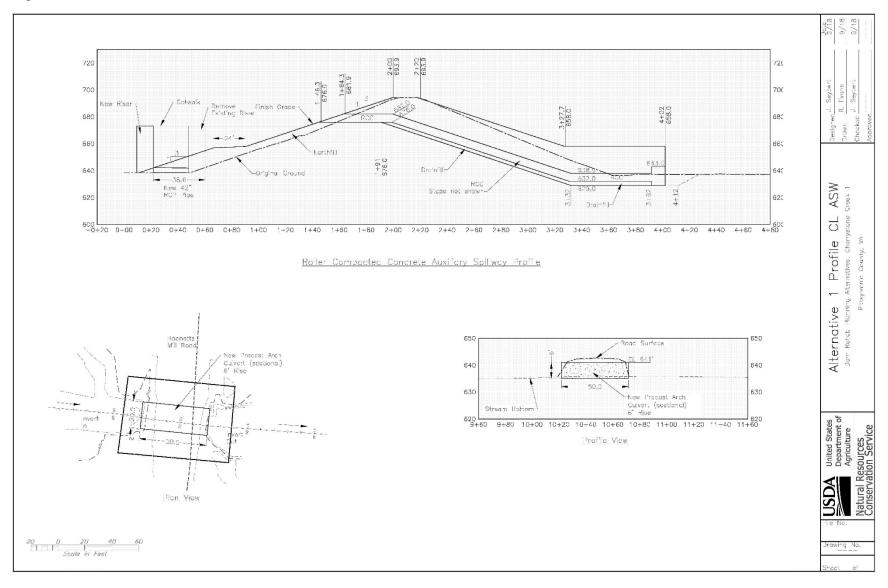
Preferred Alterative - Details of Embankment, Toe Drain, and Culvert.
